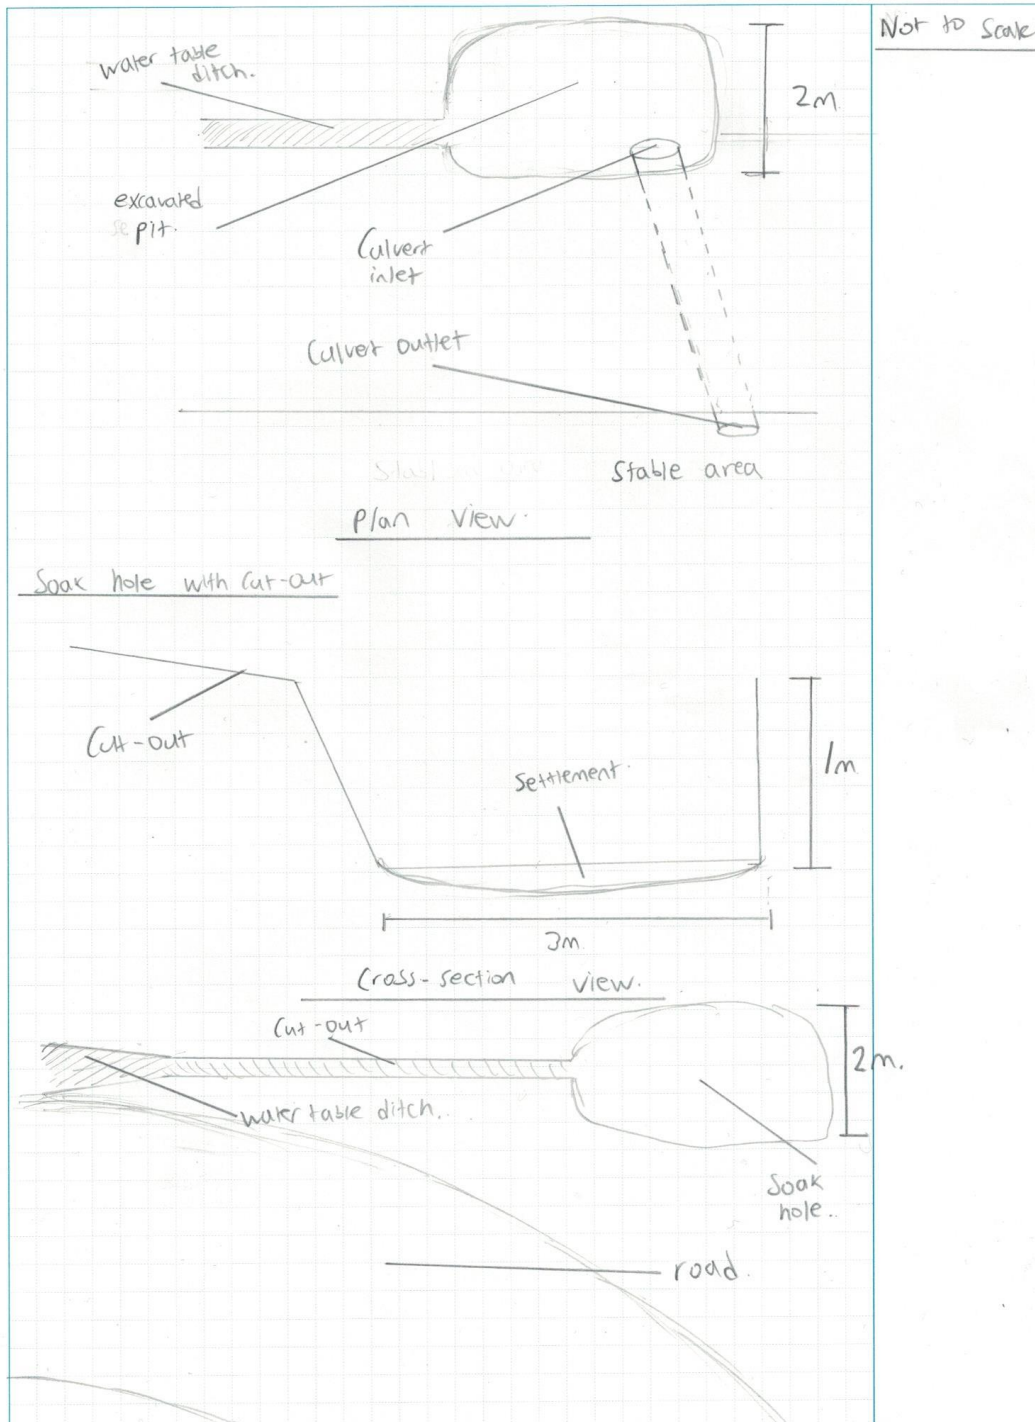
Plan view of sediment trap with culvert and soak hole with cut-out, and cross-section view of soak hole with cut-out.
